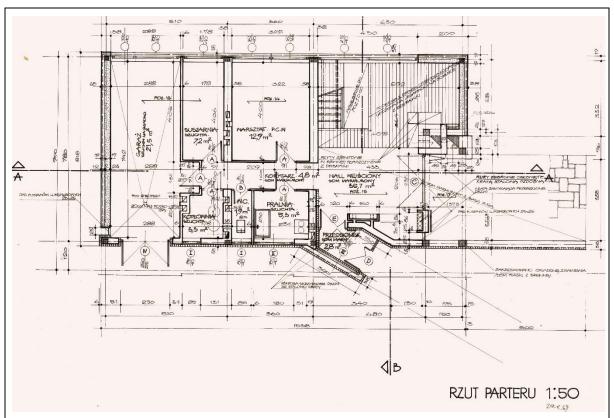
Floor plan of the lowest level of the house, J. Jarecki, 1969.
